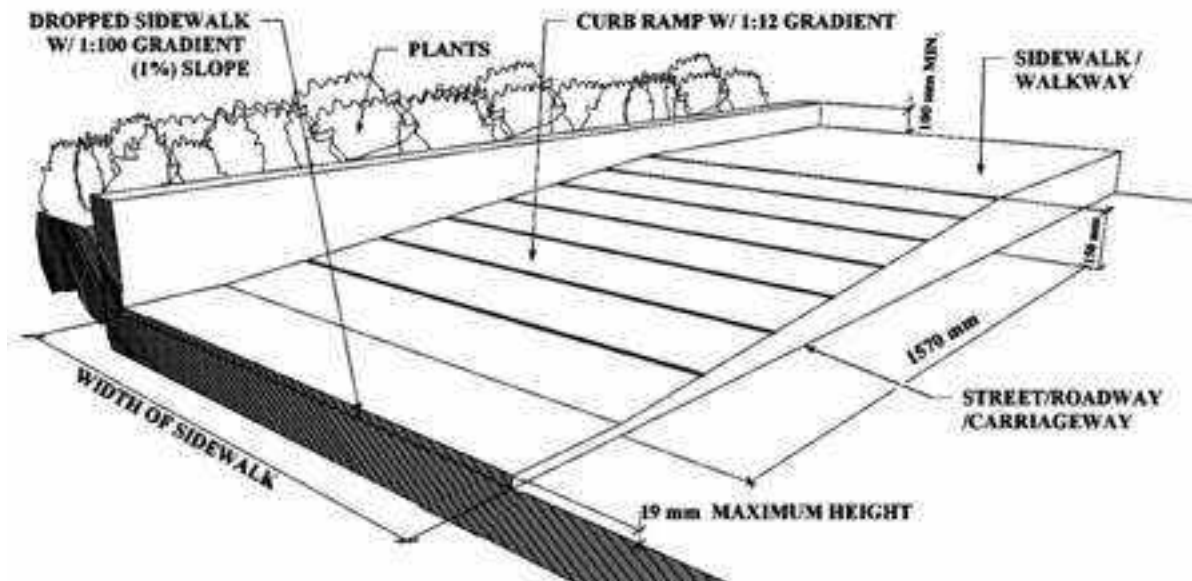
3D Cross Section of a typical Dropped Sidewalk
